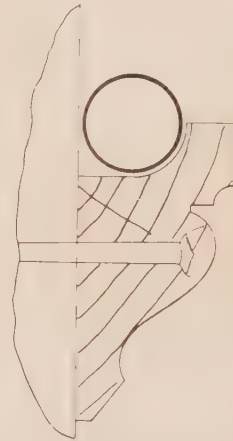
Lead Pipe supported on Wooden Fillet.
